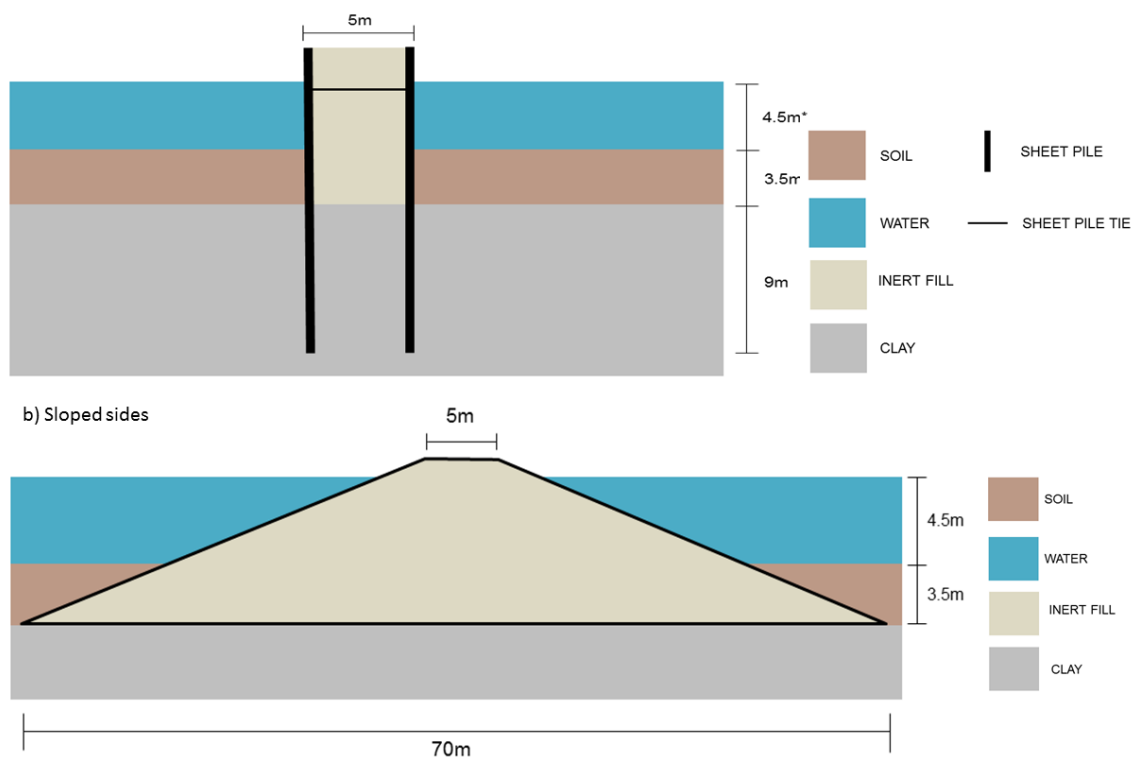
Typical cross-sections of the separation embankments in the lakes.
